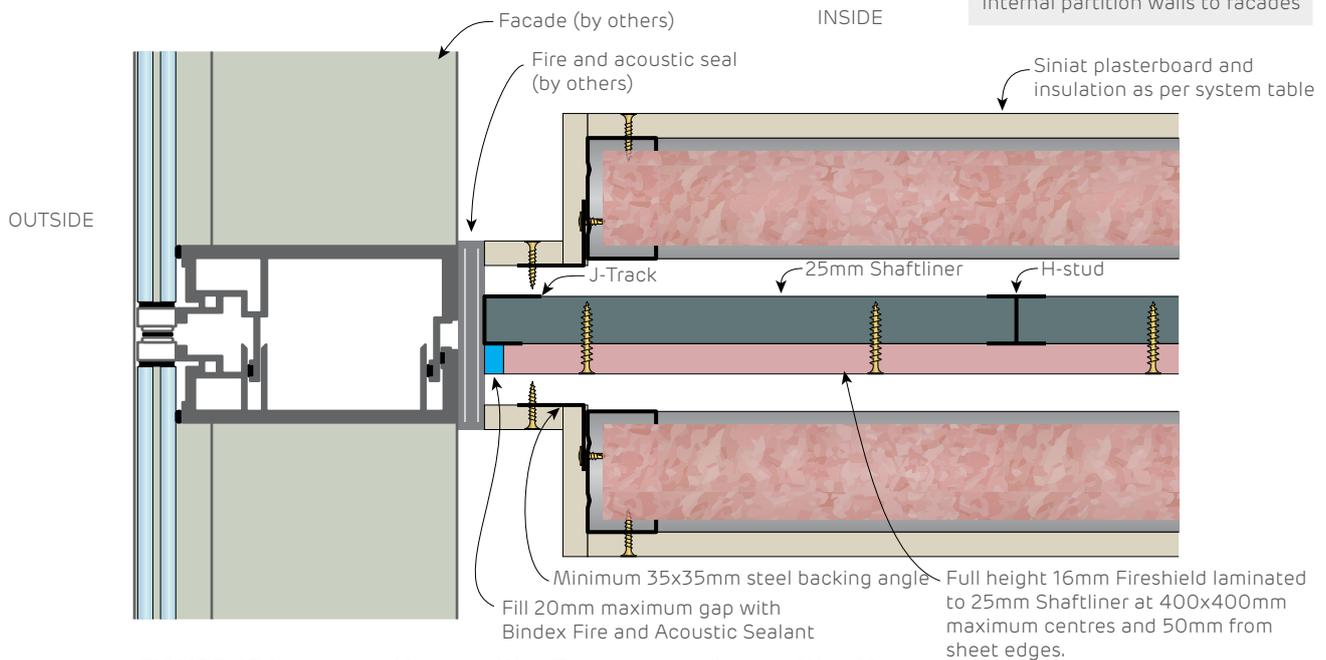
Interhome Highrise Wall Transition to Curtain Wall Mullion Plan
